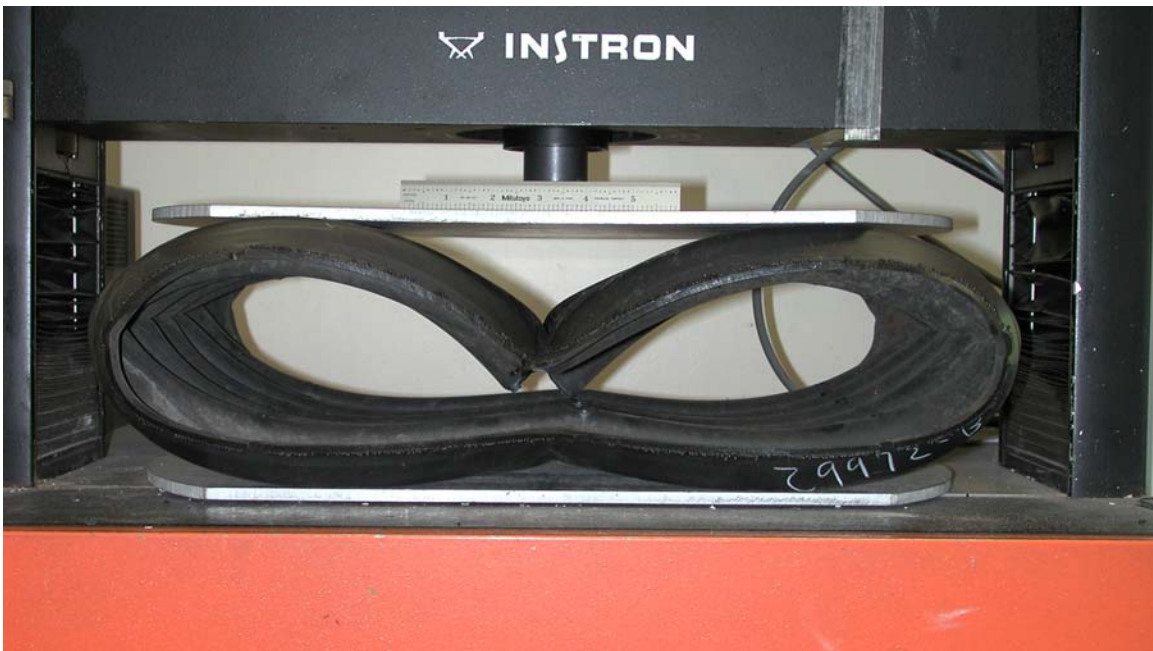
12-inch diameter sample loaded in the test machine and ready for testing.
